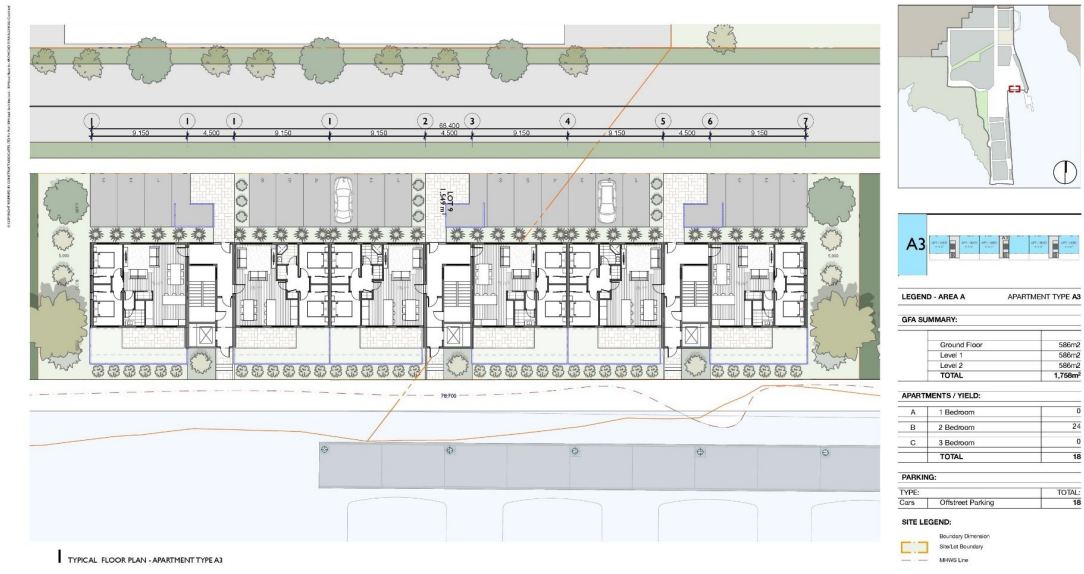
Part G – Eastern Harbour Edge (Area A) Floor Plans
